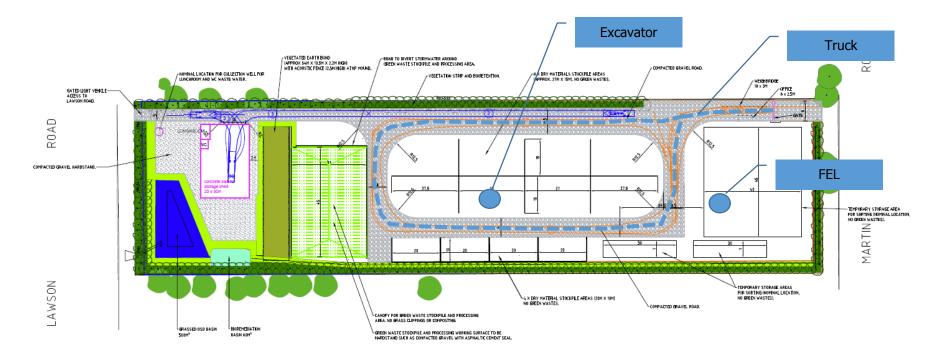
Site Plan showing Barriers & Source Locations – Scenario 1
